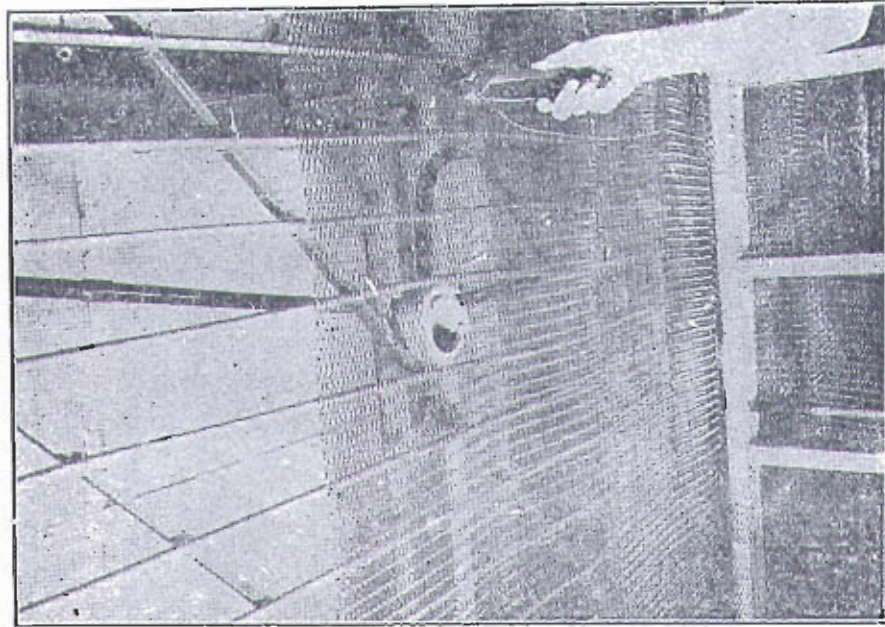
Showing method of wiring metal lath to supporting channel when heating coils are installed in ceiling.
